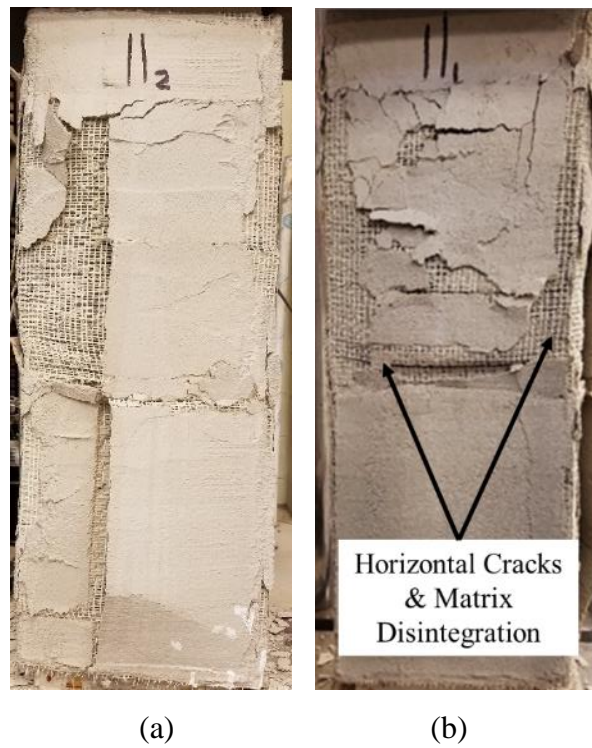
Column C-12-0-2-2 Failure (a) Fiber Debonding at Overlap, (b) Horizontal Cracks and Matrix Disintegration on Jacket Surface
